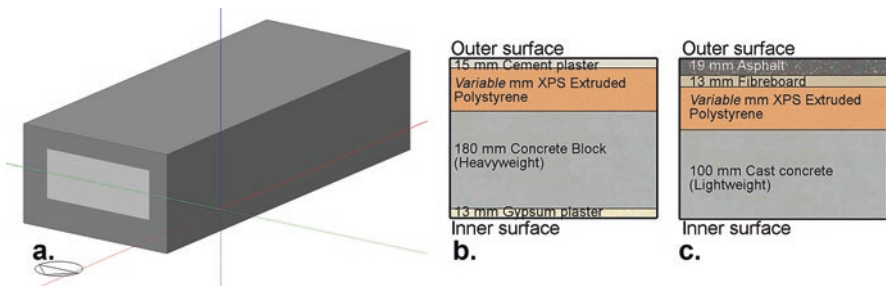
(a) Design Builder’s external view of the simulated unit. Three vertical walls and the roof are exposed to external conditions, while the last wall and the pavement are assumed as adiabatic, (b) configuration of wall layers, and (c) of roof layers. The insulation layer is the one whose thickness is automatically changed through the Python code
